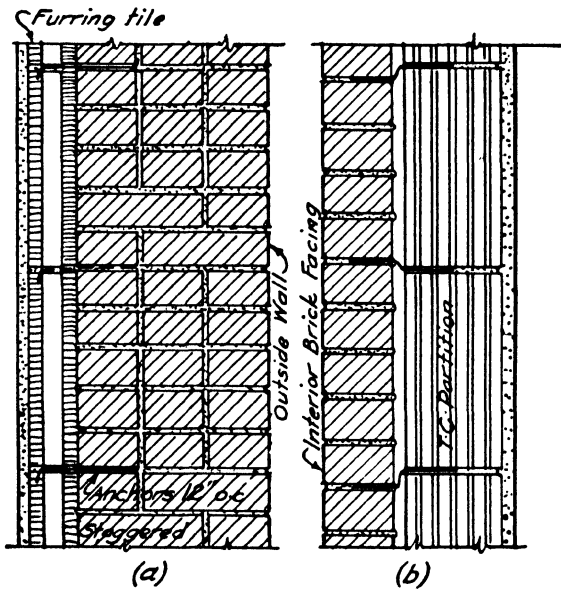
Wall Facing. (a) exterior wall furred with terra cotta; (b) interior wall faced with brick.
